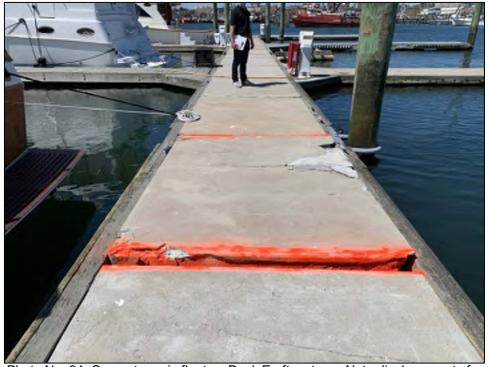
Concrete main float on Dock E after storm. Note displacement of float and trip hazard.
